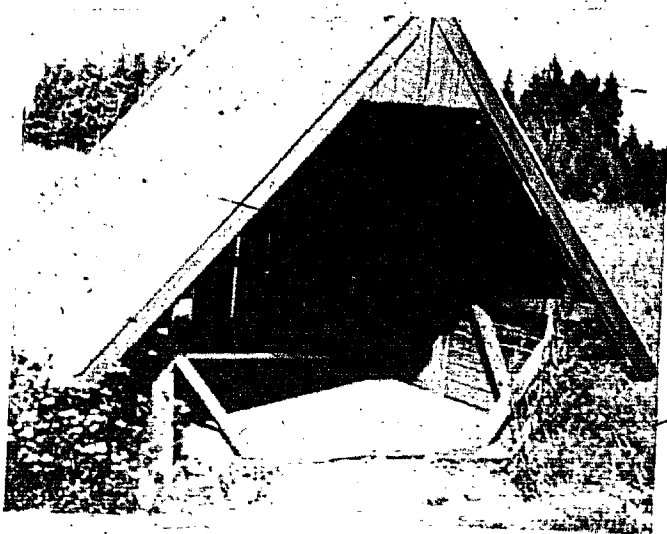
Photograph showing ground entrance to underground pump room at Freiham. Wooden shack over ground door to hide it from aerial observation.
